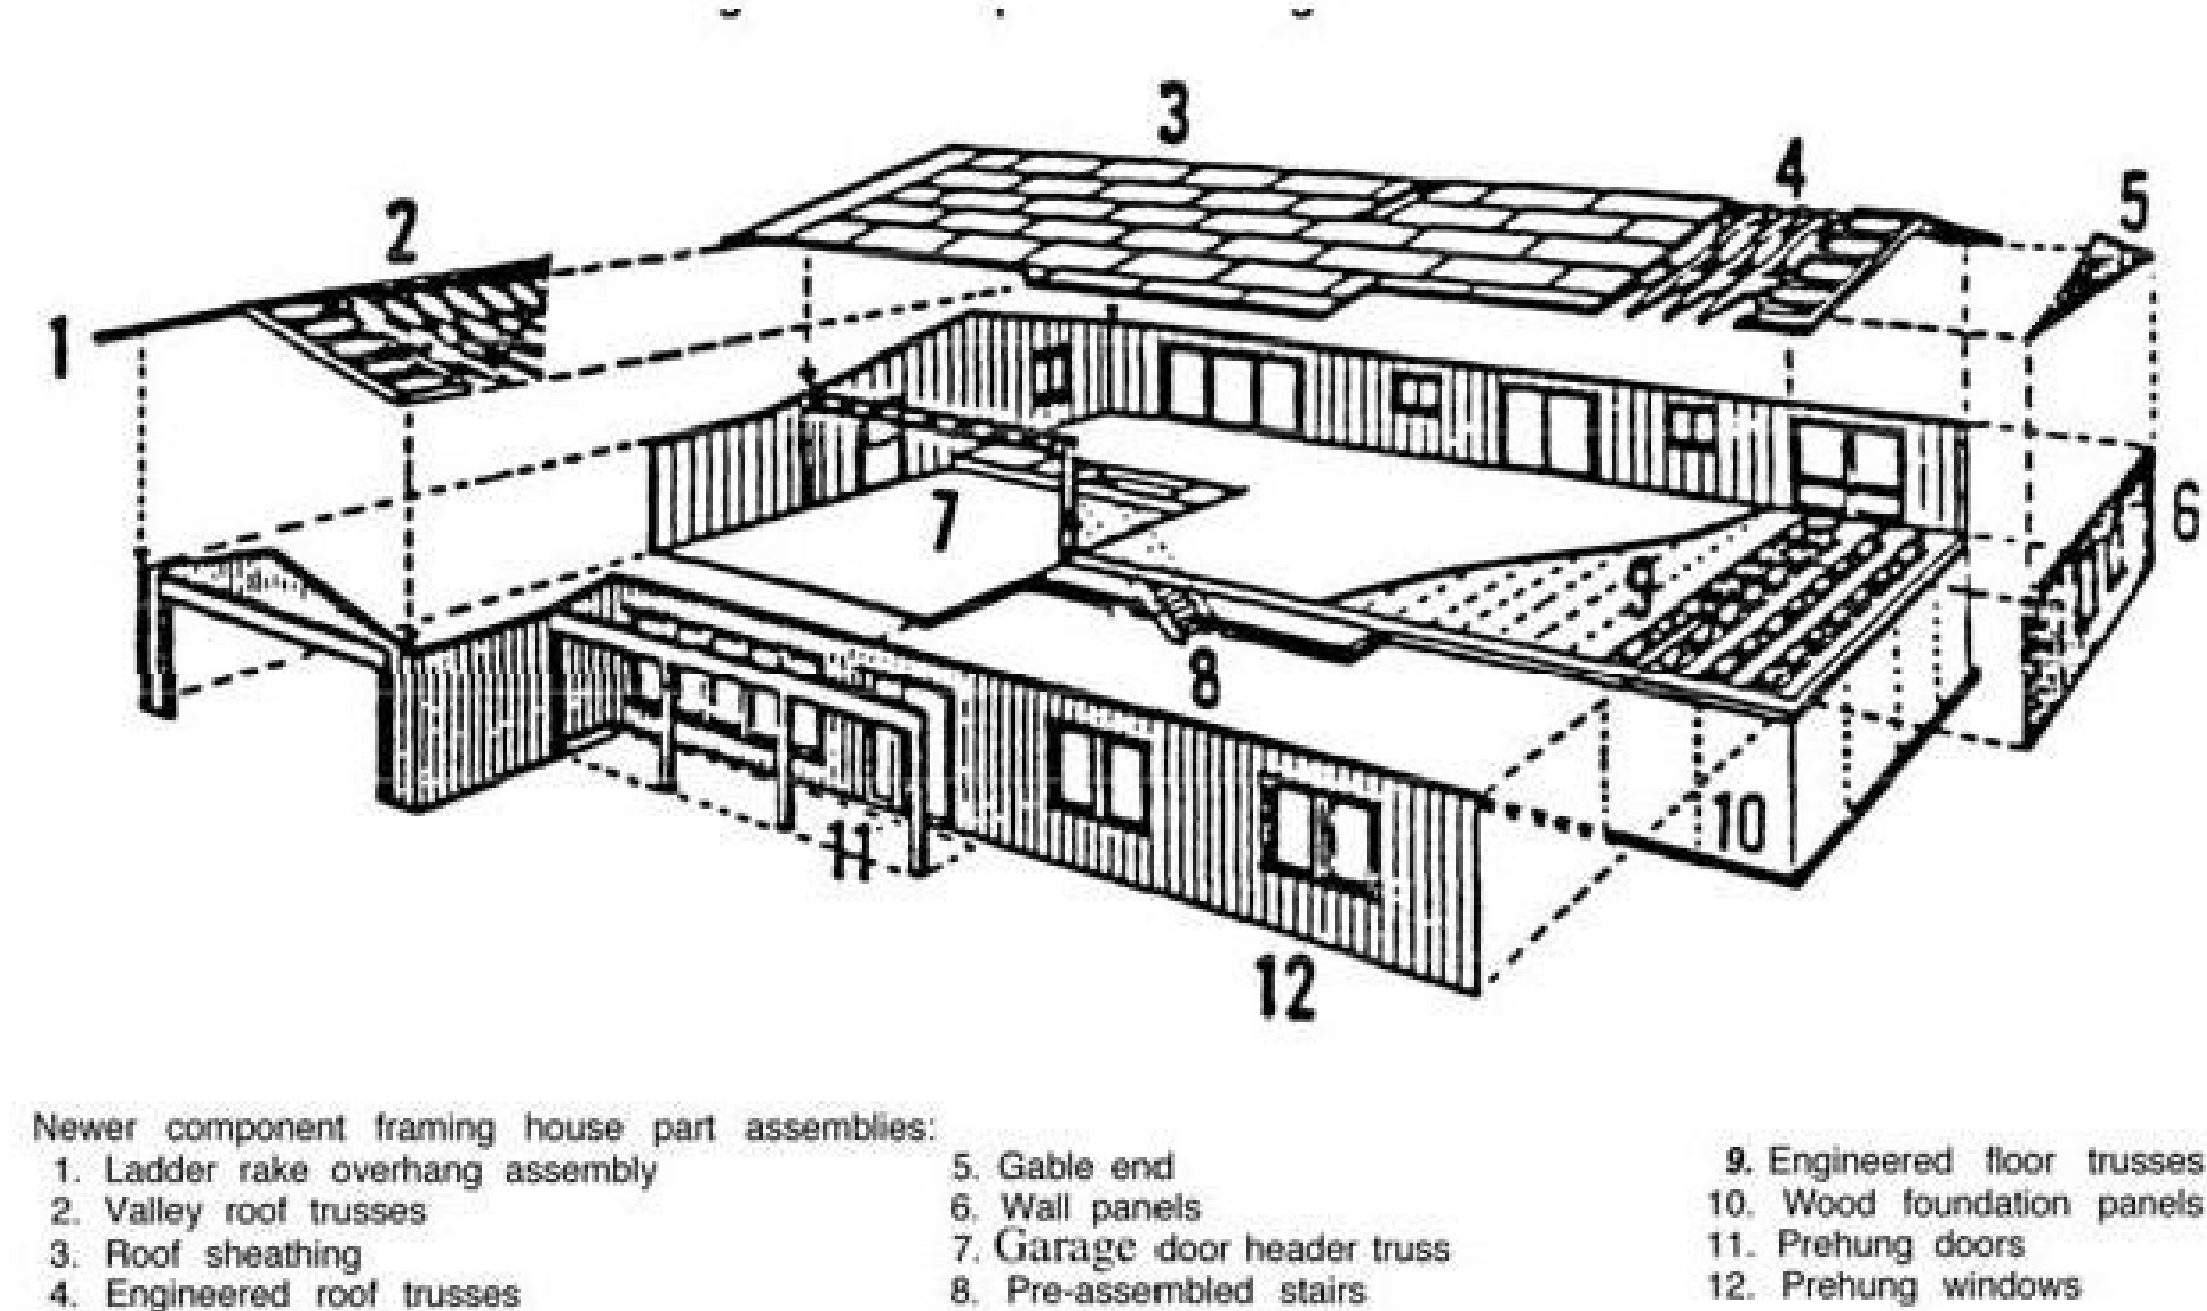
Exploded View of a house using all prefab components, OTA-TET-315 p20
